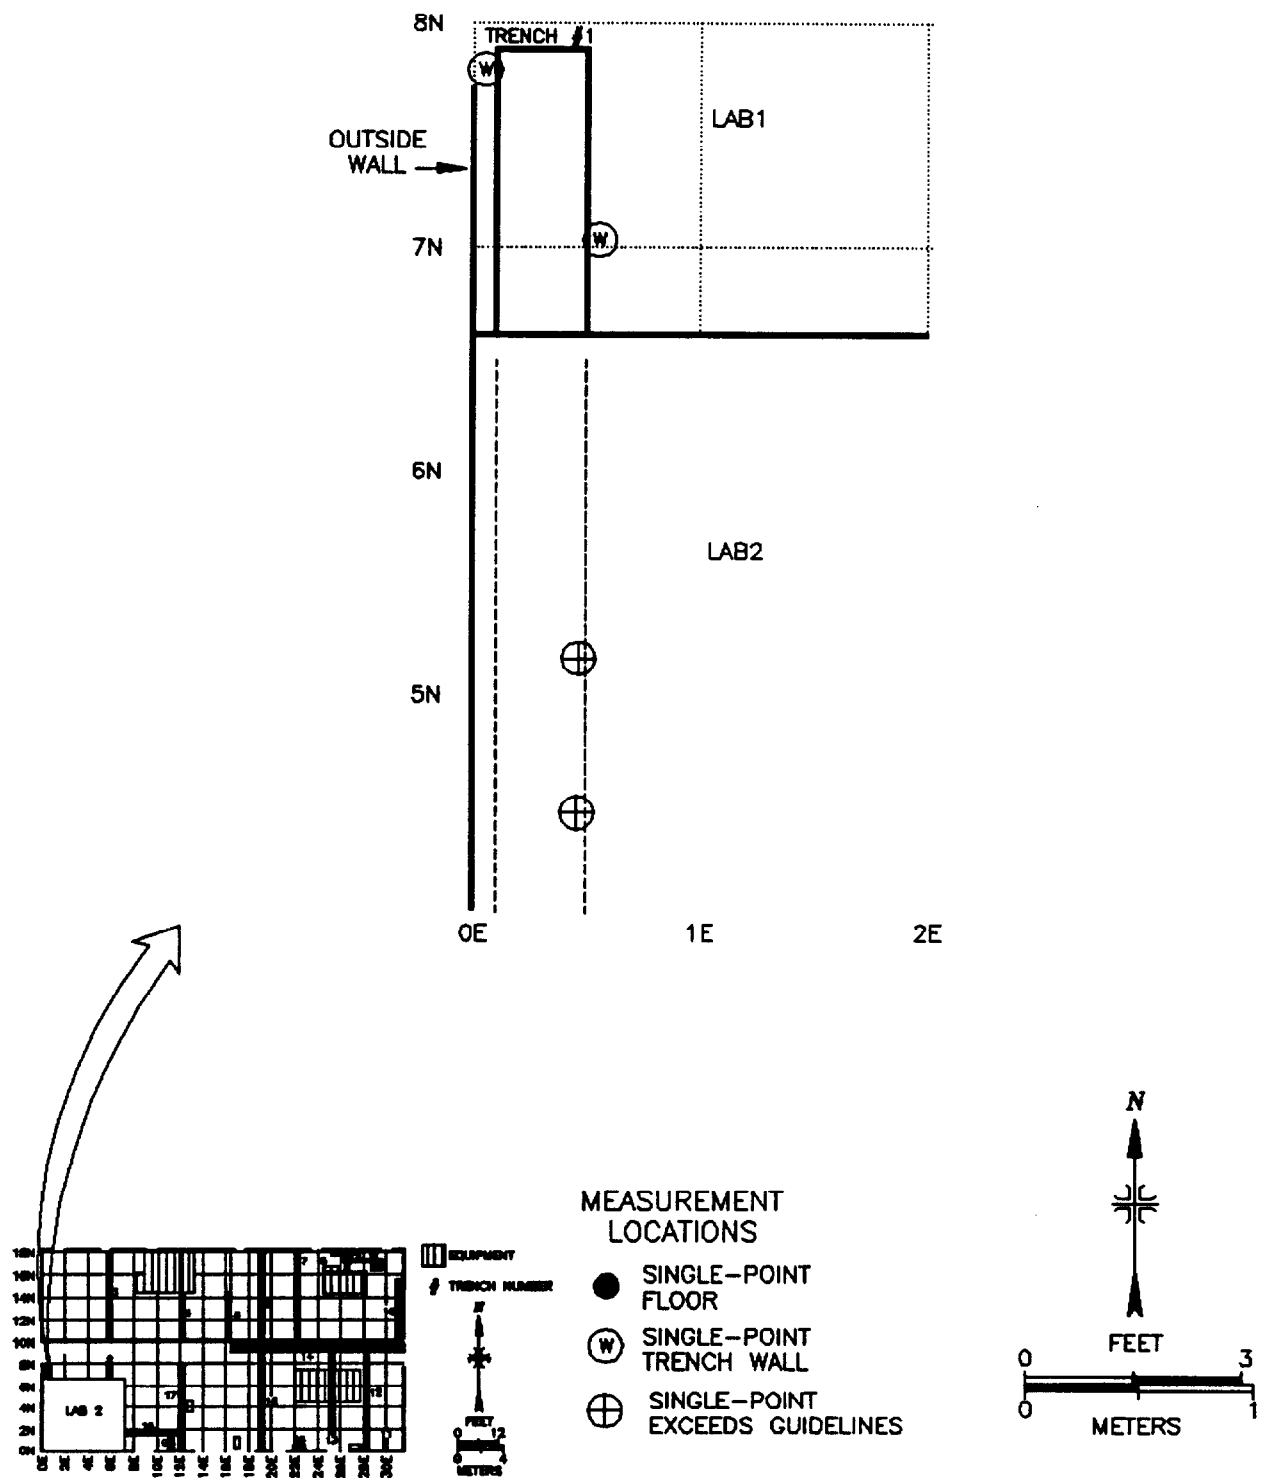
Building 23, Lab 1, Trench #1 – Measurement Locations
